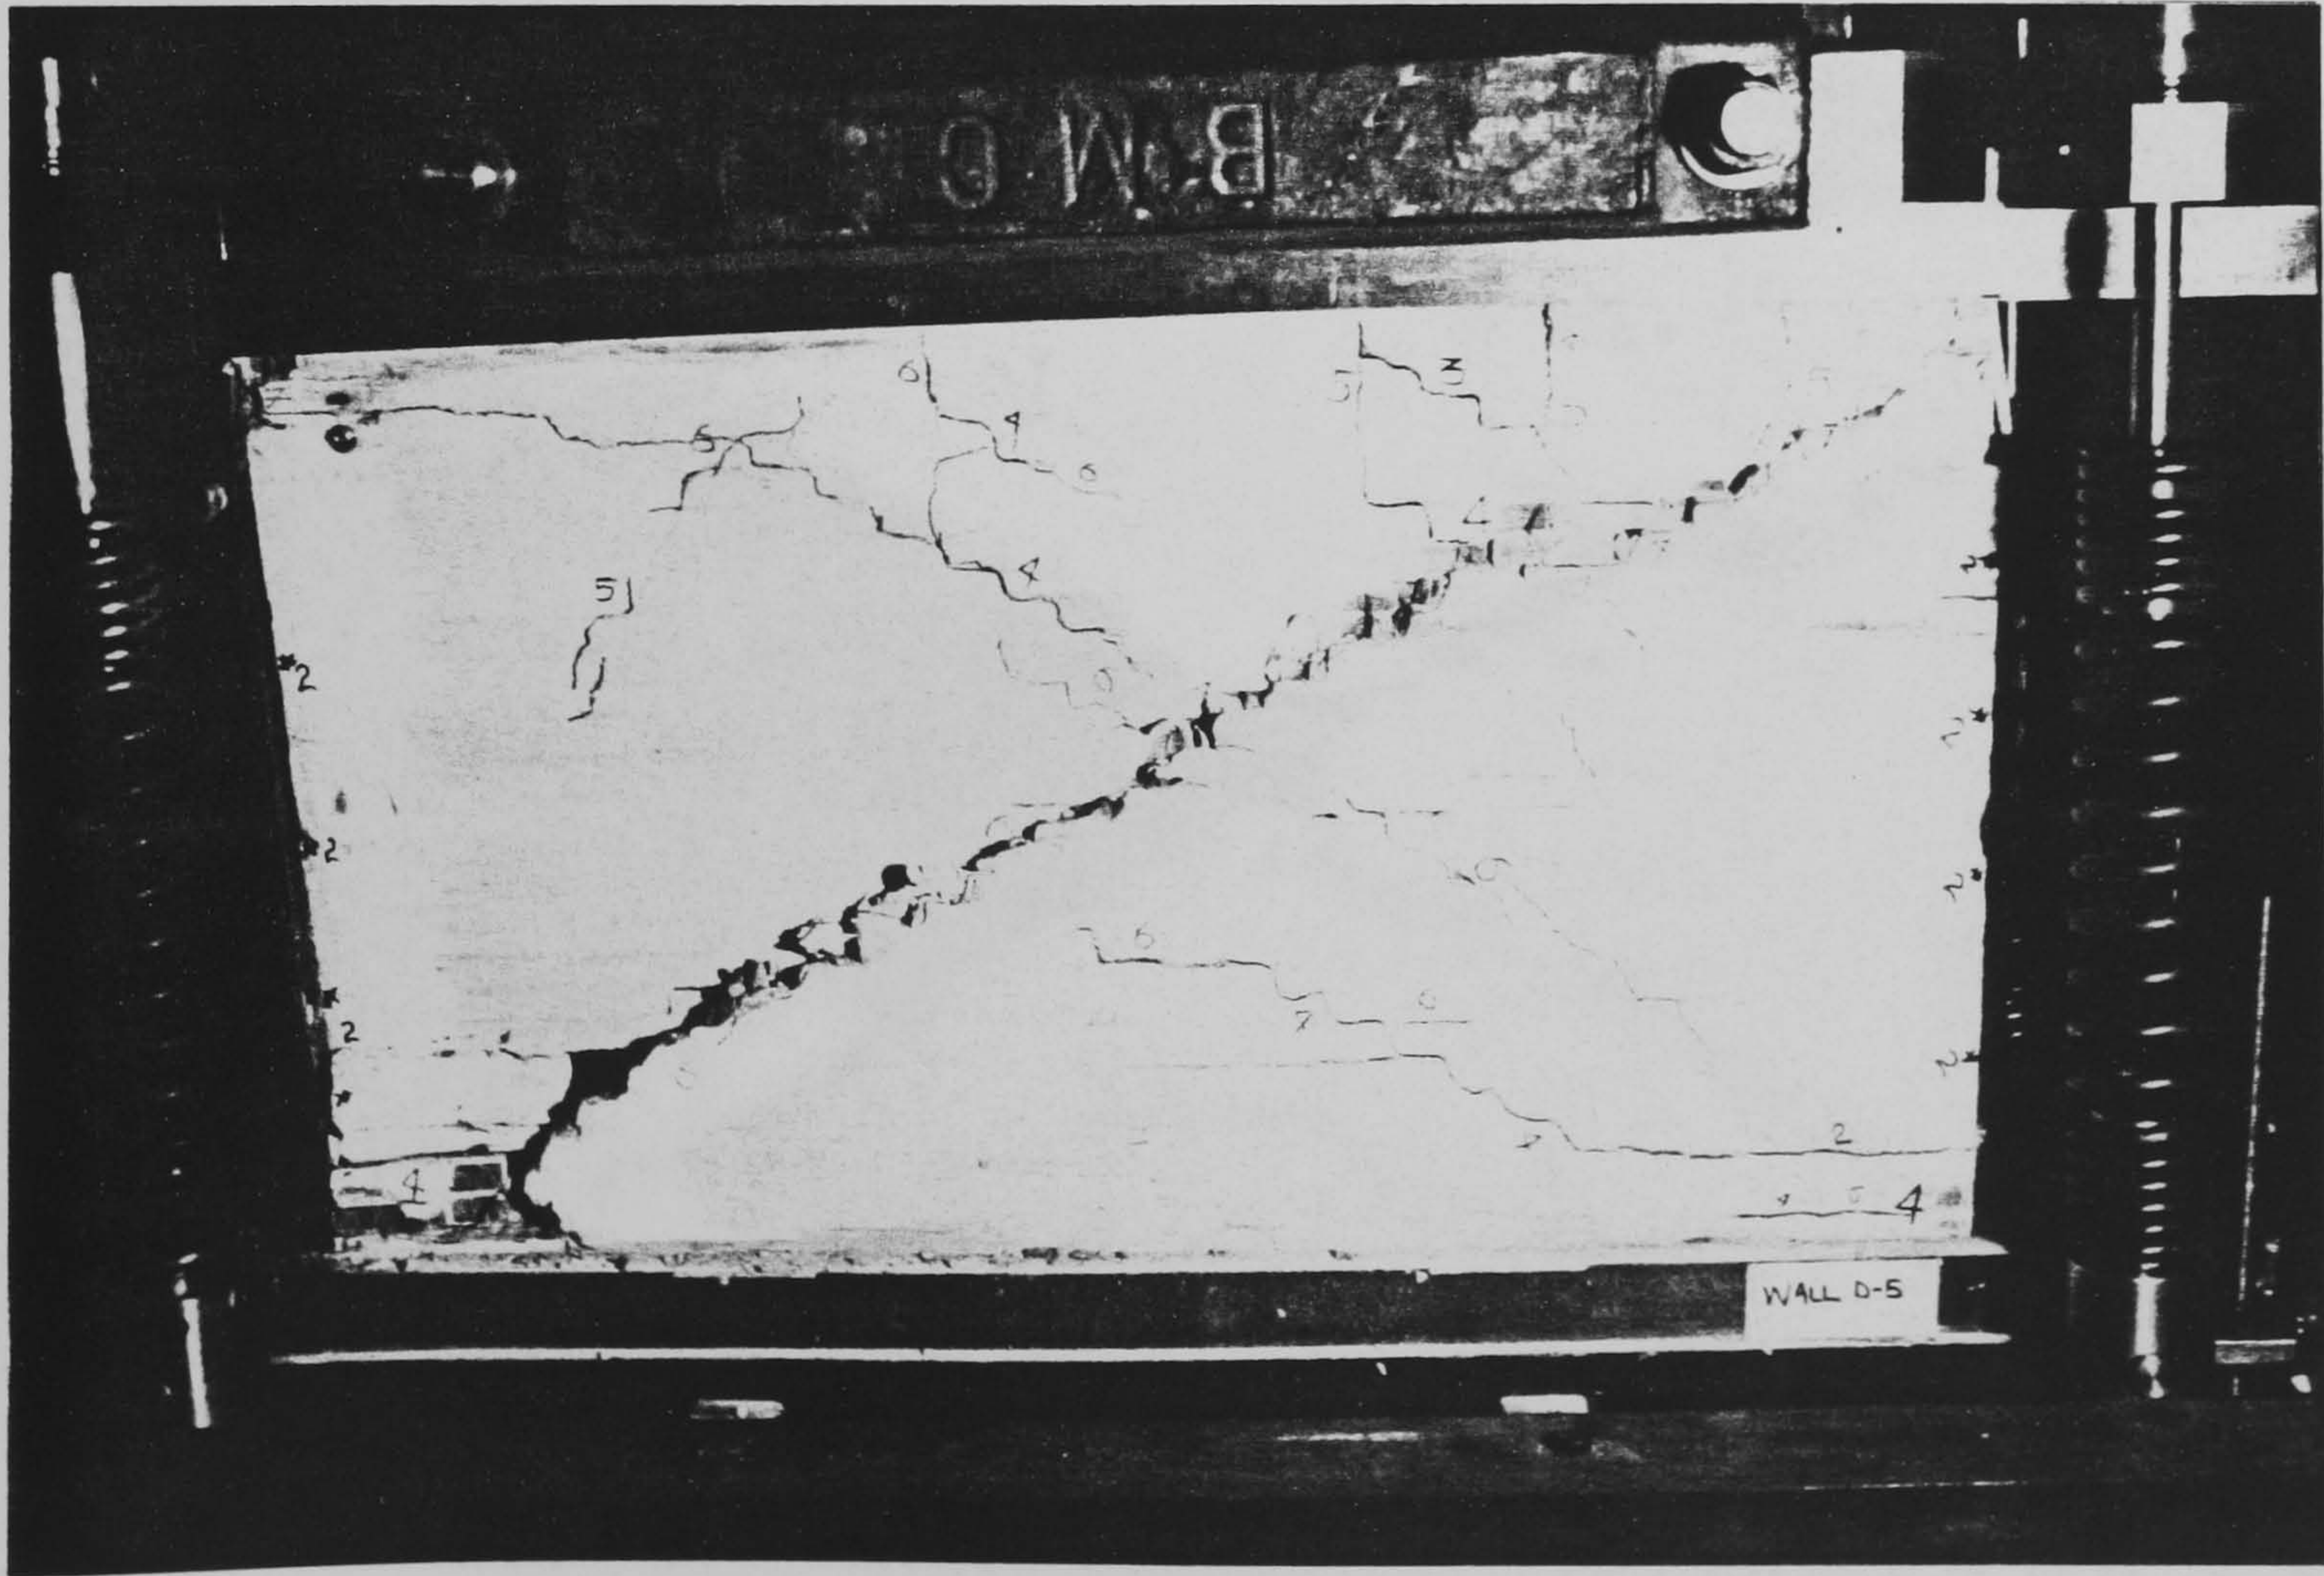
Collapse sequence-frame 6 (wall-D)
